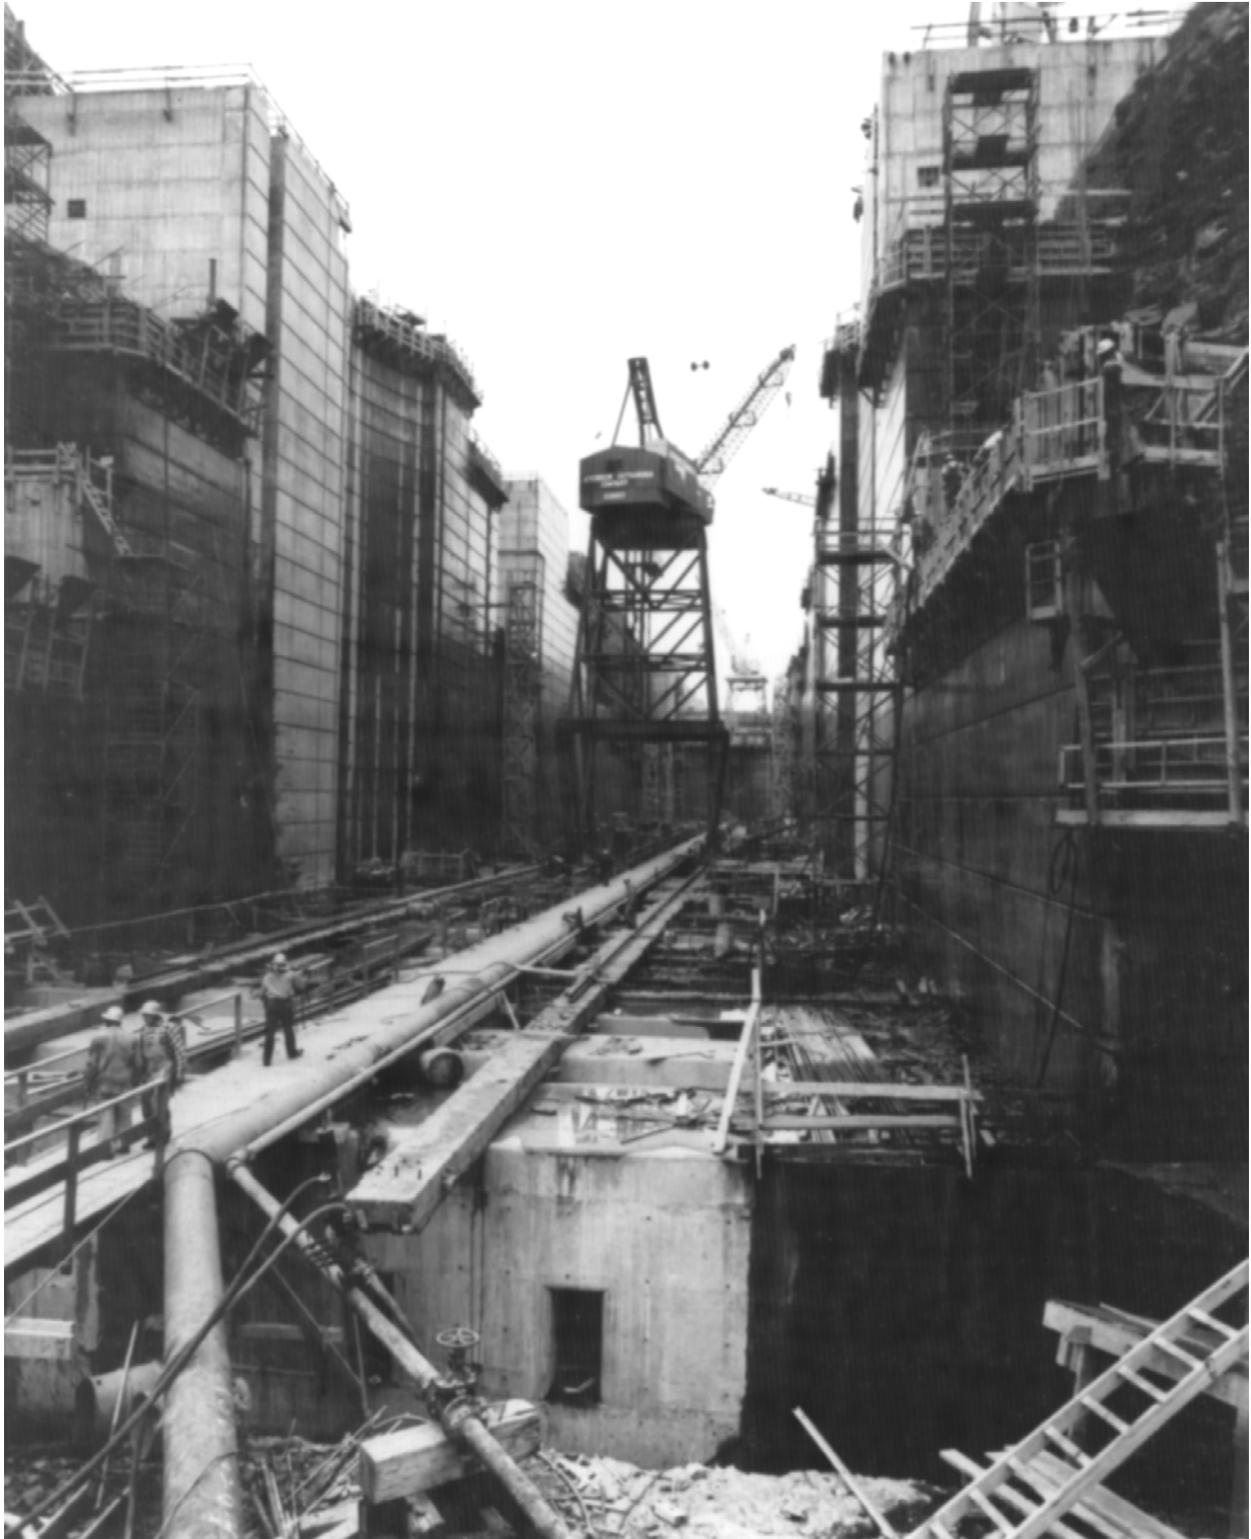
Lock with thin walls. The Dalles Lock, Columbia River, with design lift = 88 ft (under construction)
